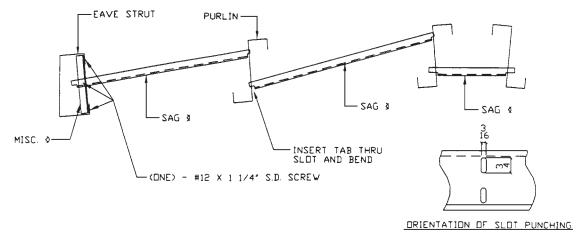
Details of diagonal bracing anchorage used by some manufacturers. (A&S Building Systems.)
